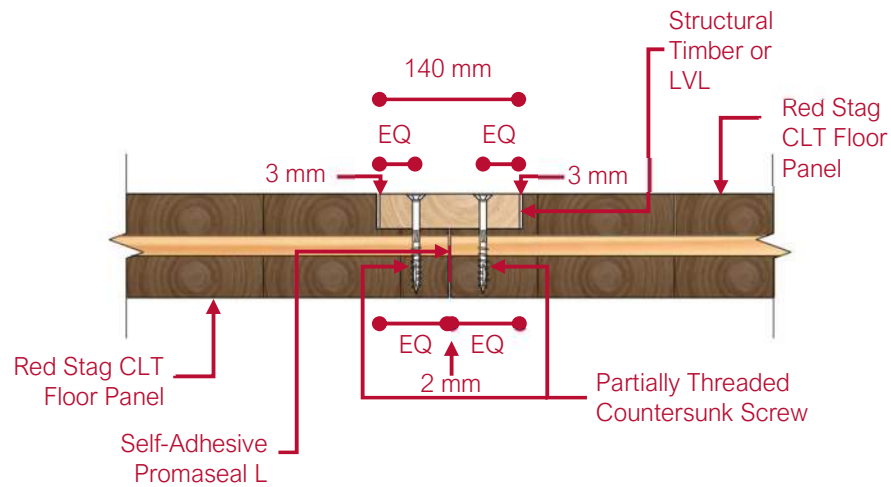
Red Stag three (3) layer CLT floor to floor with spline plate connection.
